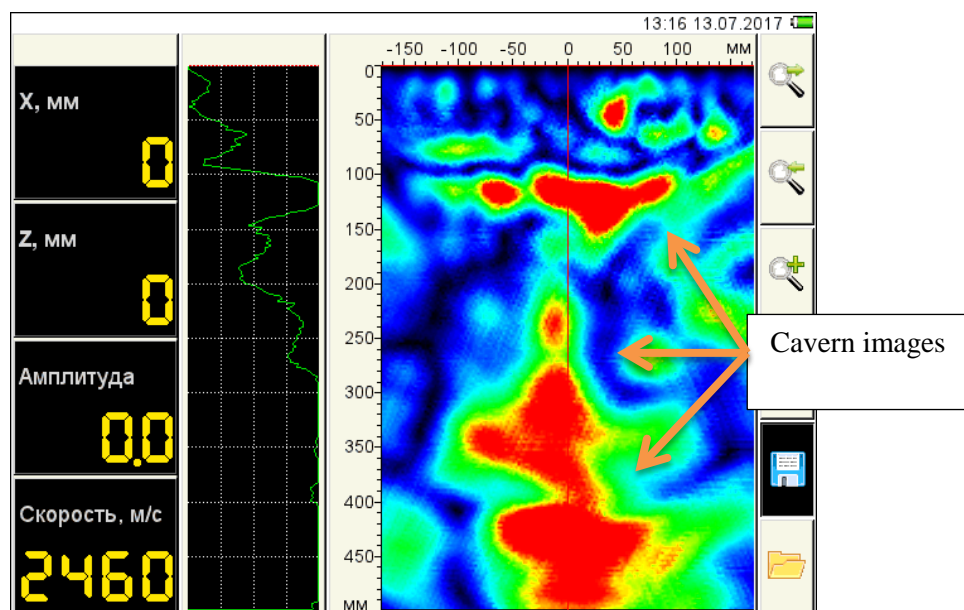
The tank wall image at the pier location with a large cavern image in the center of the pier.
